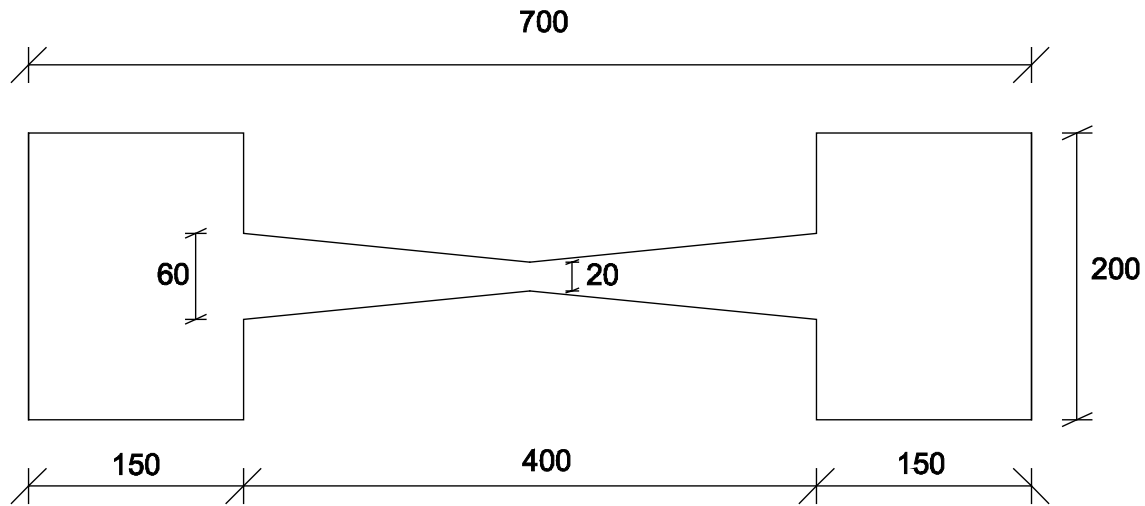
Fuse used for the entire wall system (dimensions in mm)
